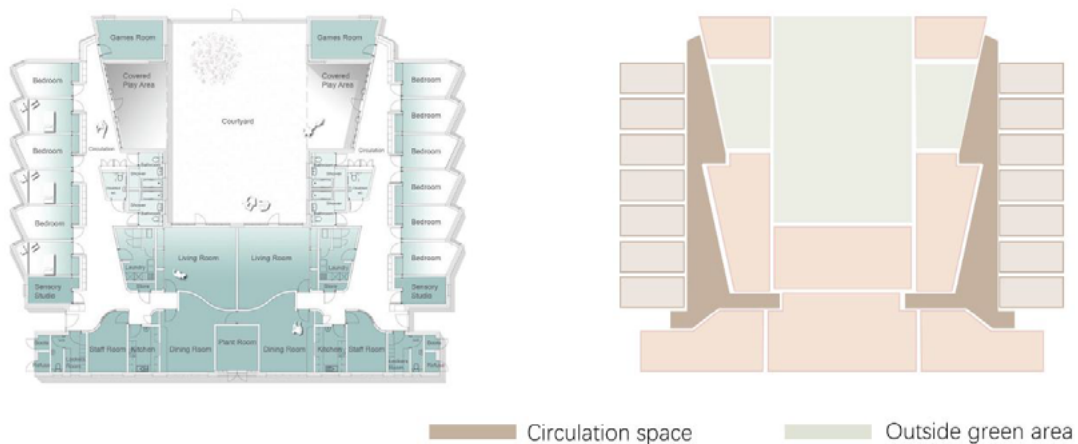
Plan of Sunfield's Rowan and Oak House, by GA Architects (Source: by author)
